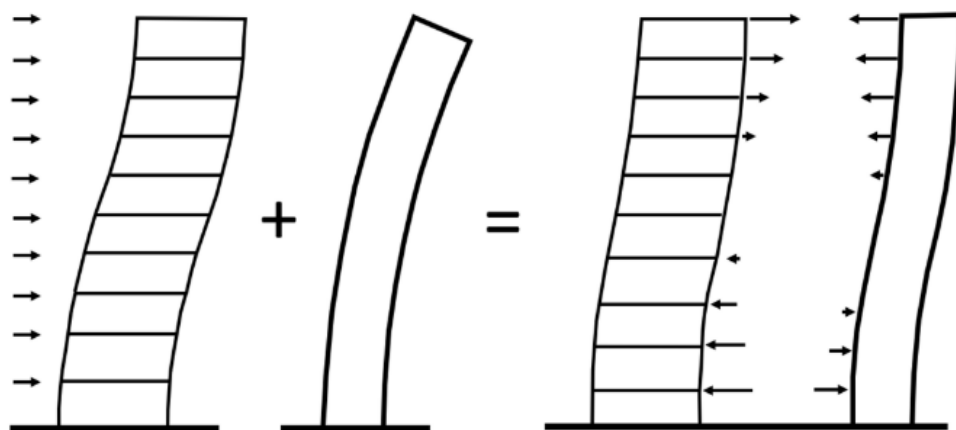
Shear wall-frame interaction system under lateral loads
